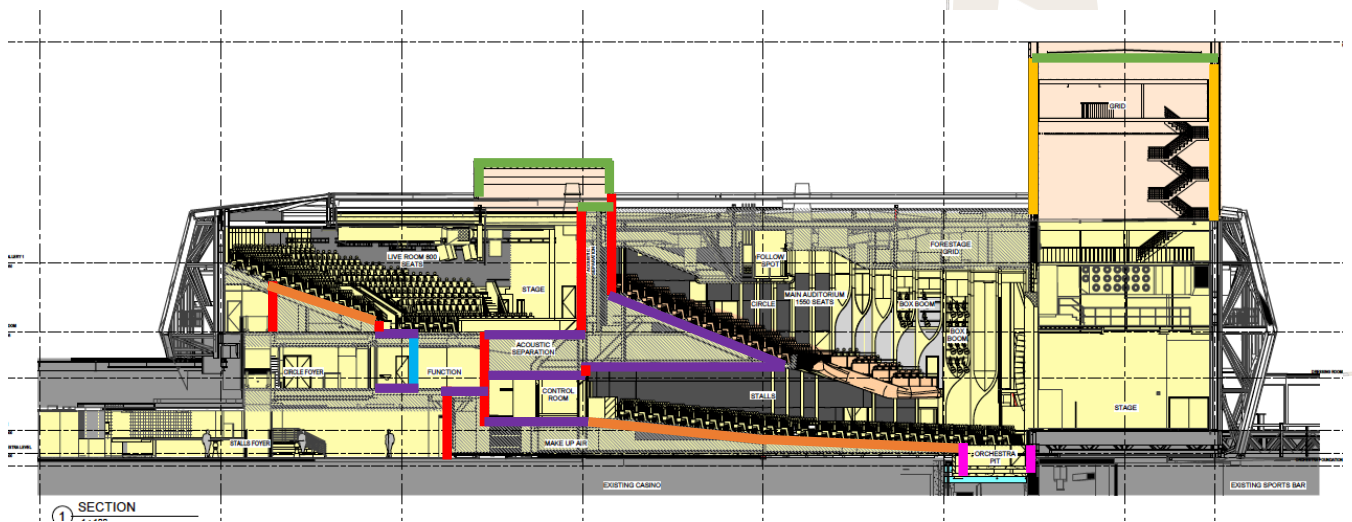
New & Existing Construction – Building Envelope – Insulation Mark Up – Section
